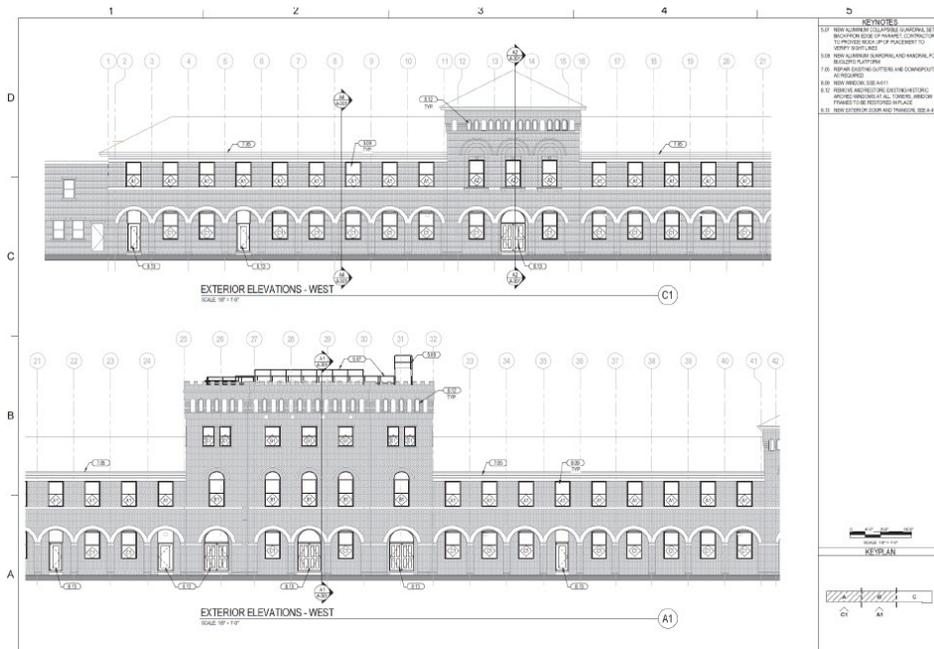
Drawings of Building 8 at Marine Barracks Washington for window replacement
